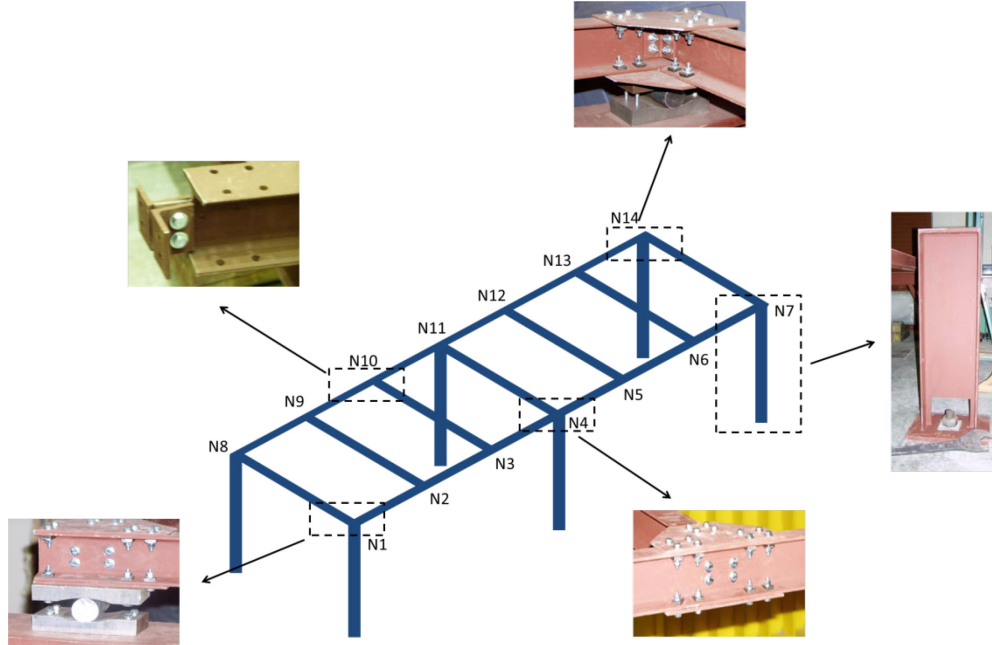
Details of the steel grid structure (adapted from Gül 2009)
